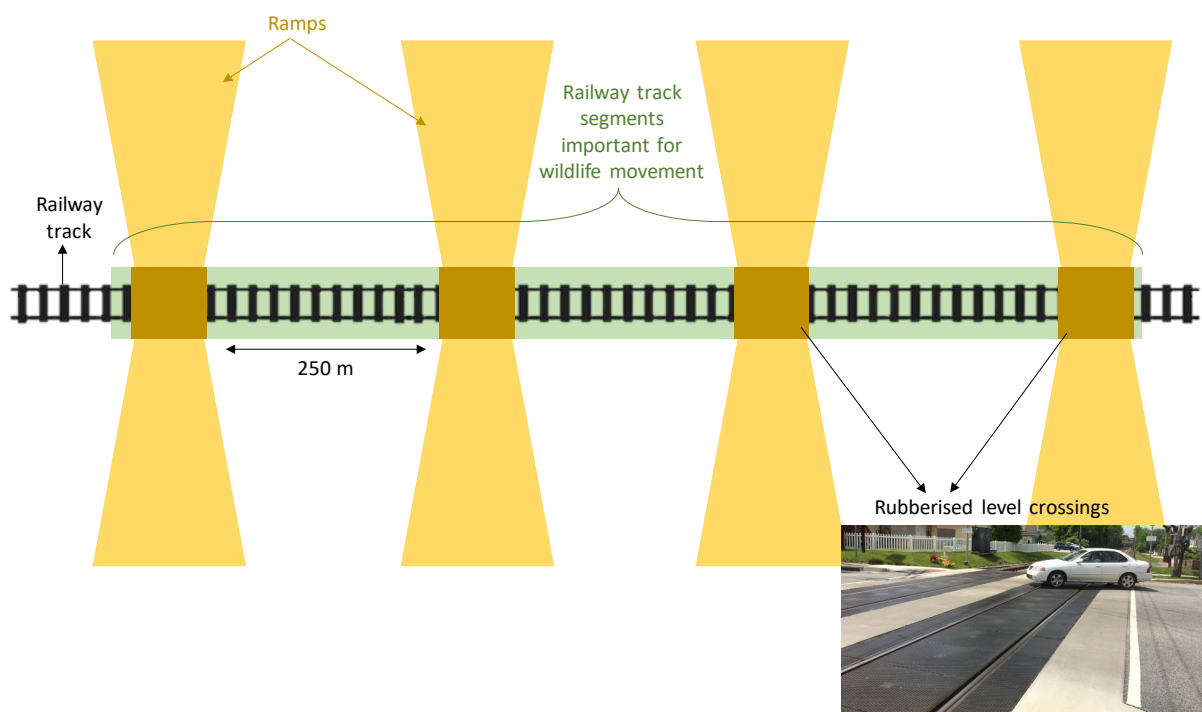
Diagrammatic representation of layout of ramps, spaced 250 m apart, on elephant movement stretches
